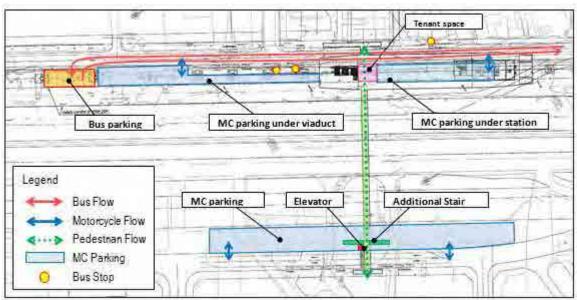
Concept Plan of the Binh Thai Station Area
